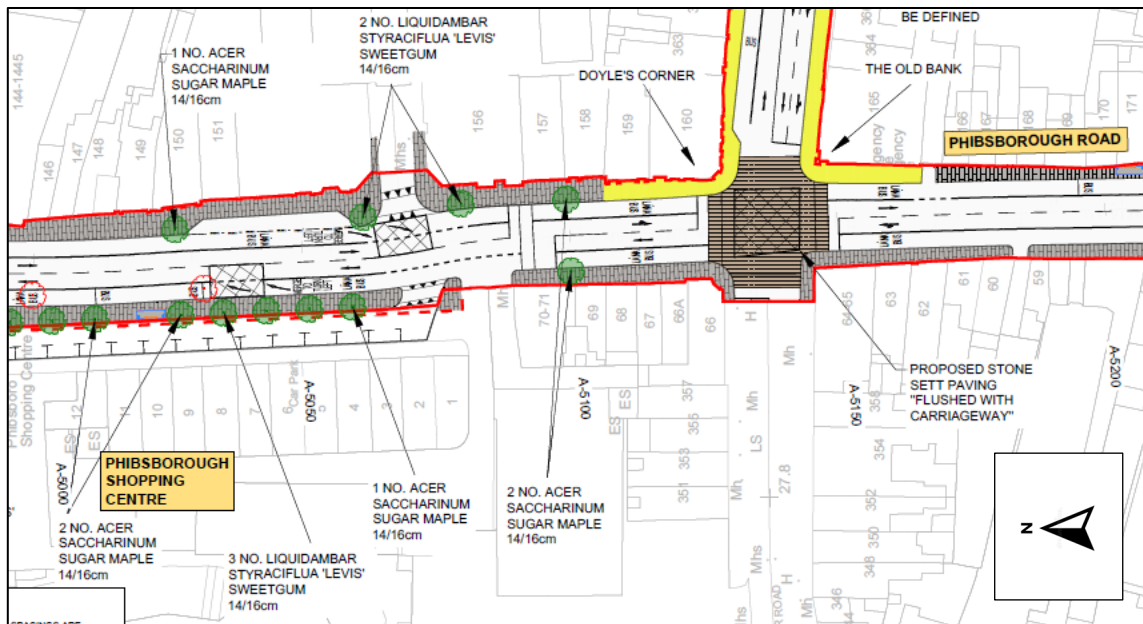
Extract from Landscape General Arrangement Drawing Sheet 14 at Phibsborough Shopping Centre and Doyle's Corner
